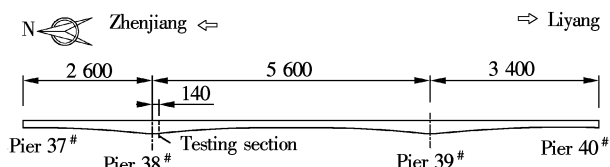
Elevation view of east-deck bridge (unit: cm)
